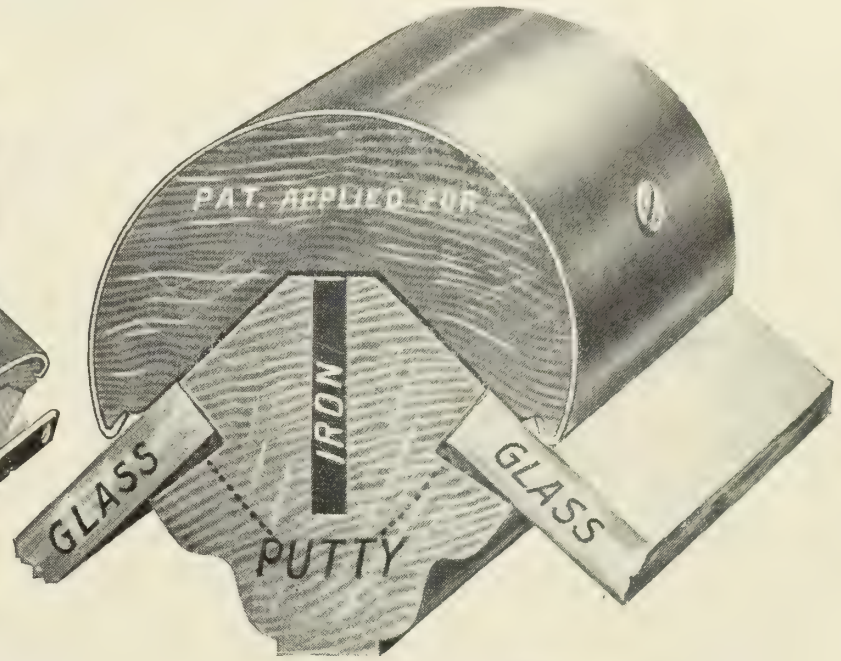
No. 30 CORNER POST (FULL SIZE)
